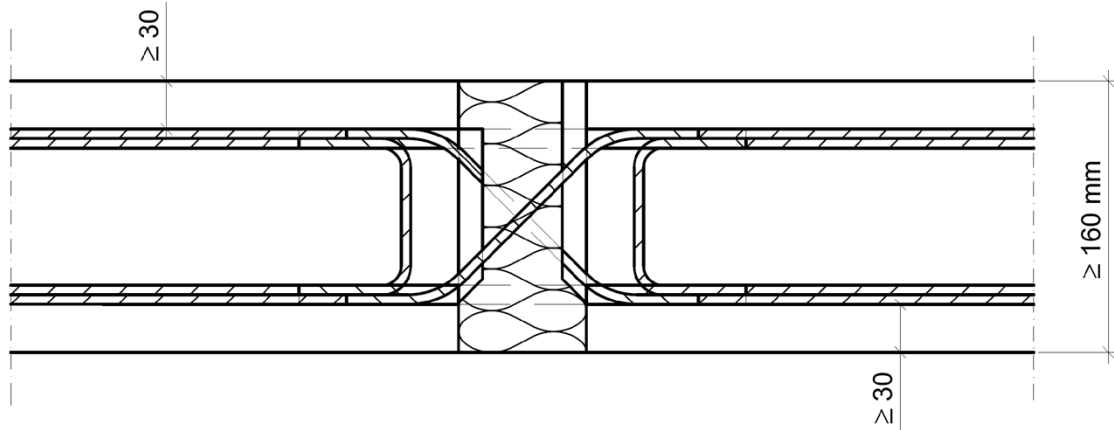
Example of Schöck Isokorb® Type D with SCE with on-site reinforcement
